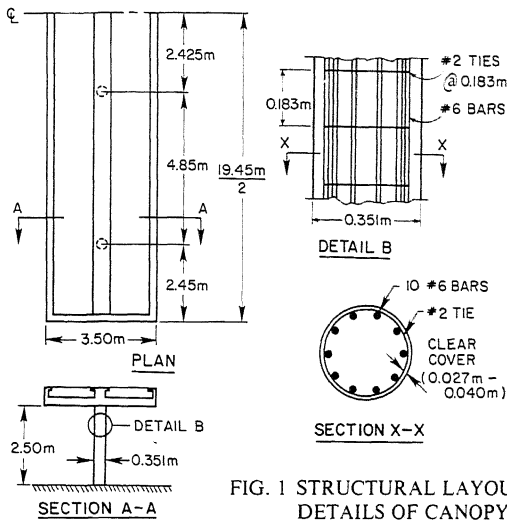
STRUCTURAL LAYOUT & DETAILS OF CANOPY
